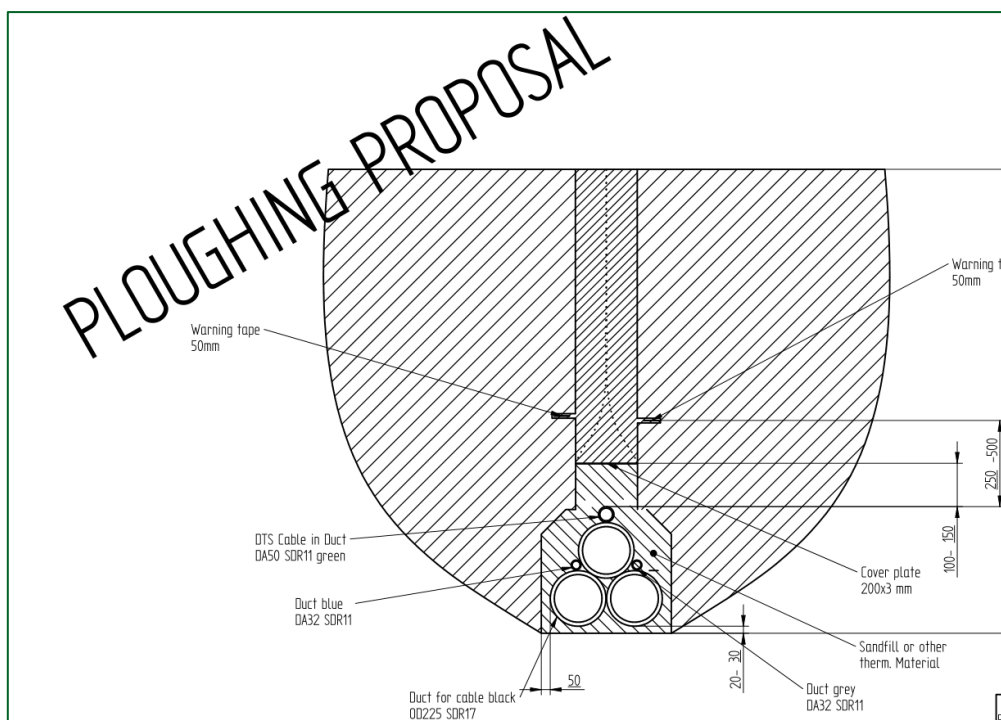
typical trefoil cable arrangement (indicative arrangement)
